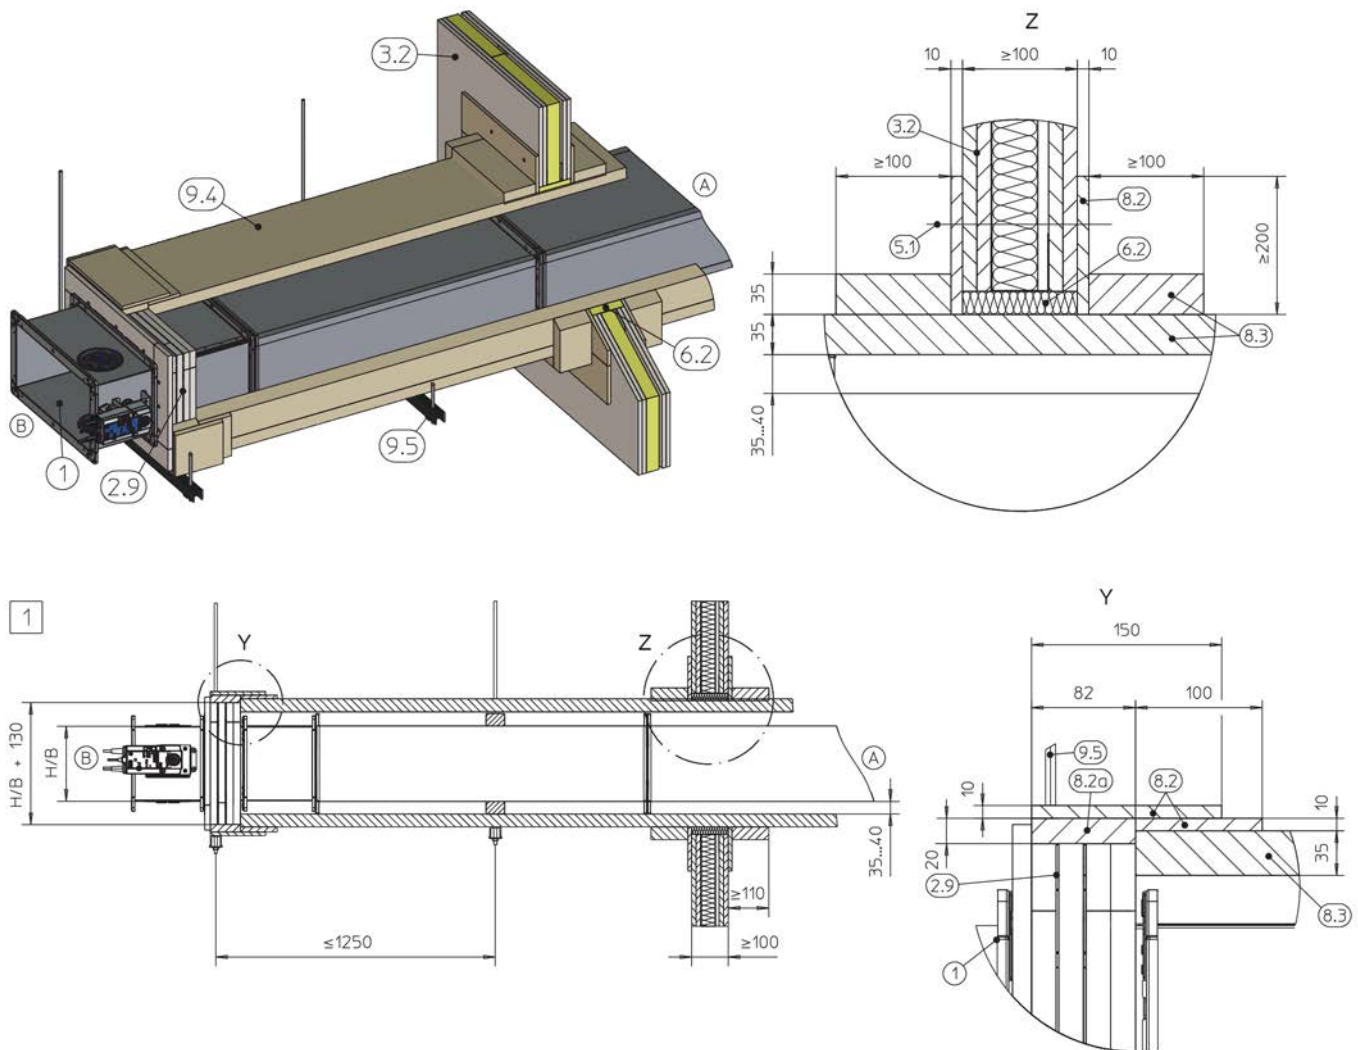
Dry mortarless installation into a lightweight partition wall, below a flexible ceiling joint
